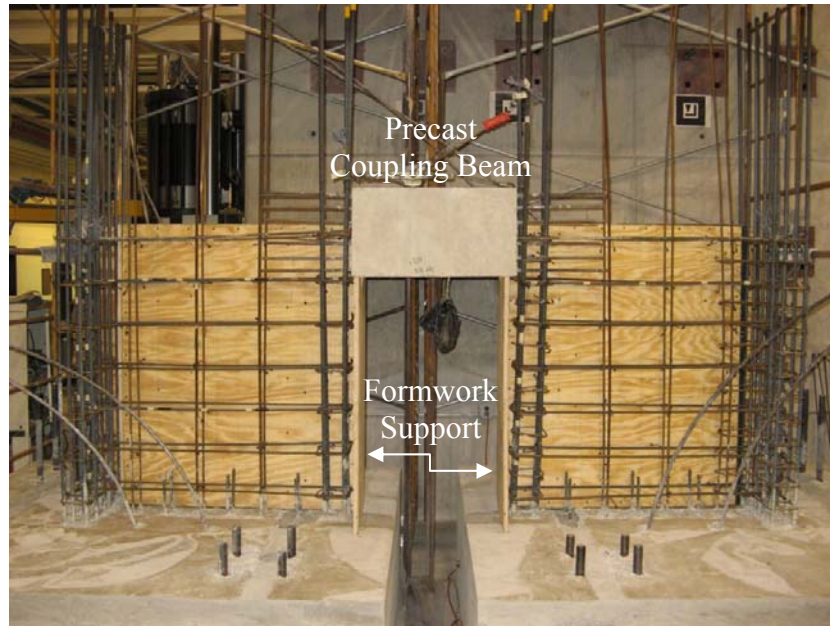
Precast coupling beam placement, supported by formwork prior to casting
